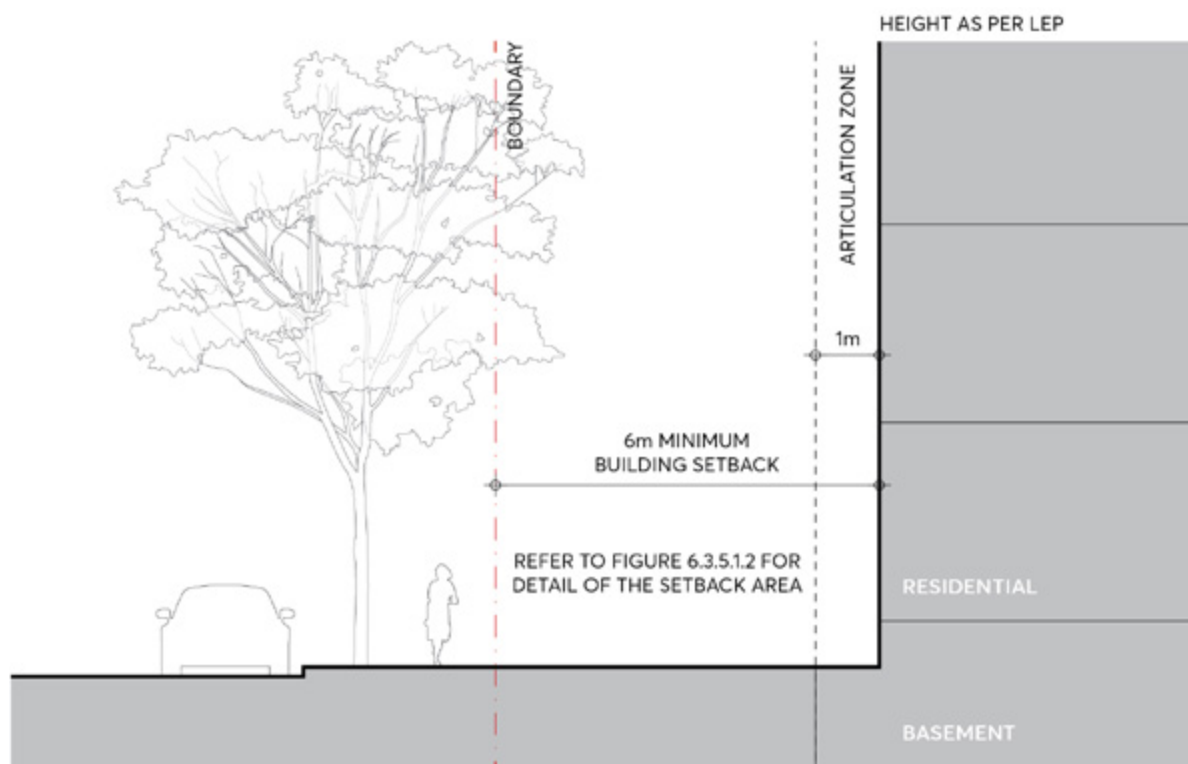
Street Setbacks - Residential Ground Floor street frontage
